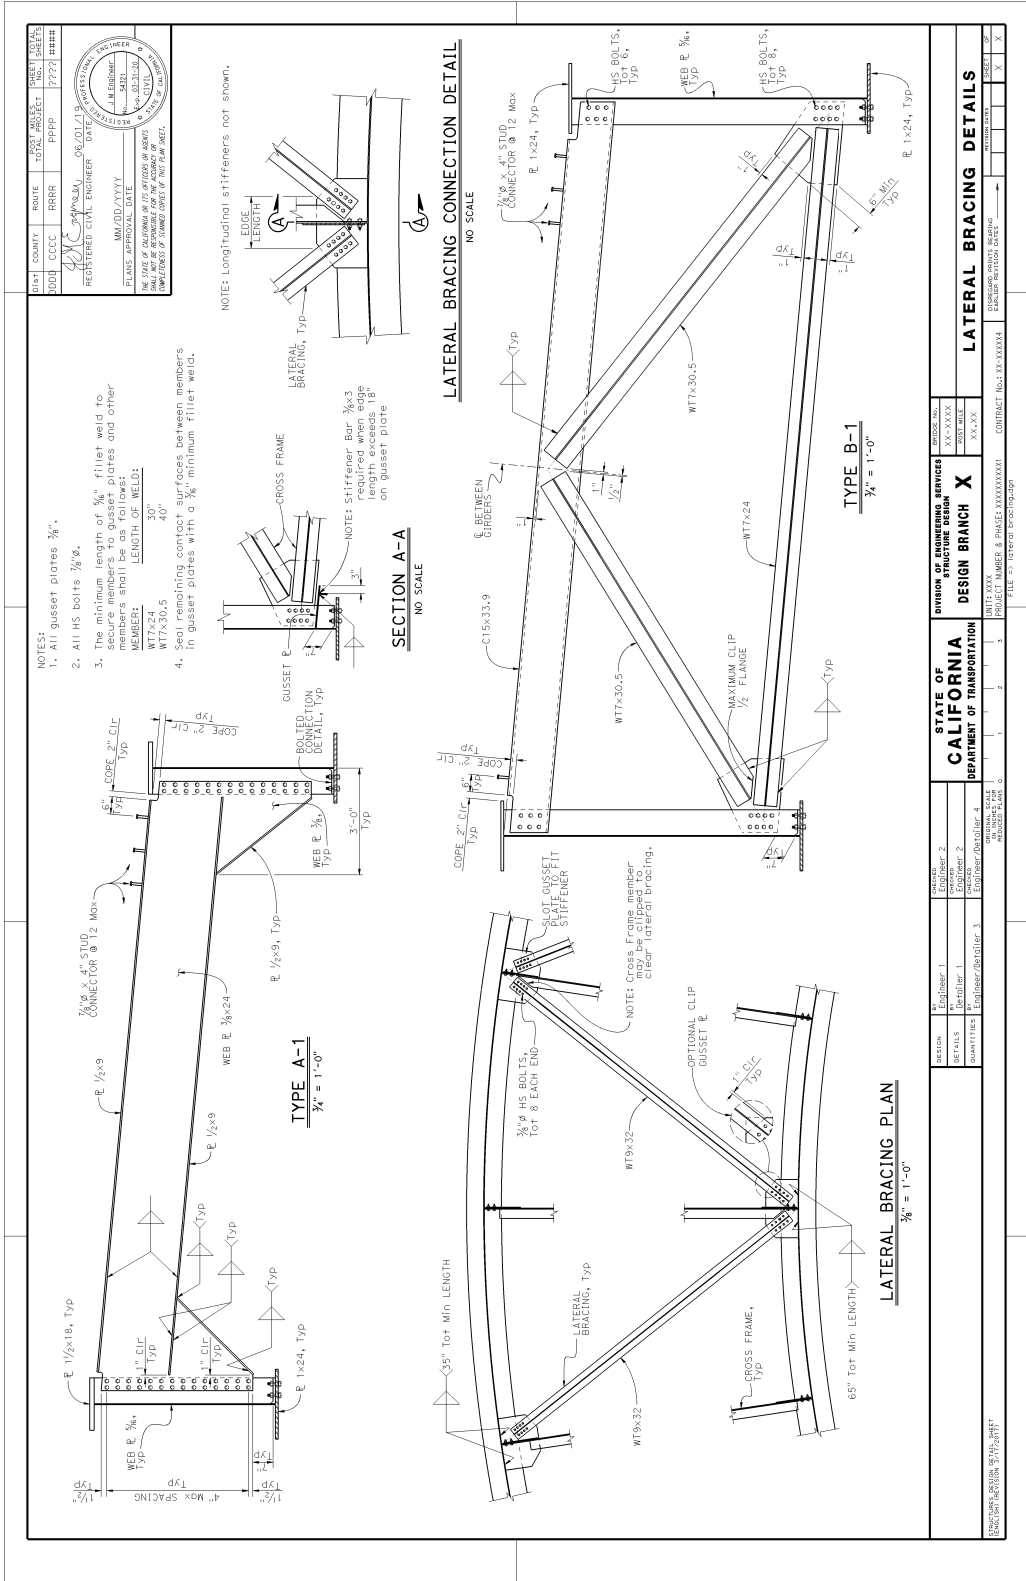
A.A.18 Steel Girder Bridge Detailing Example 18
